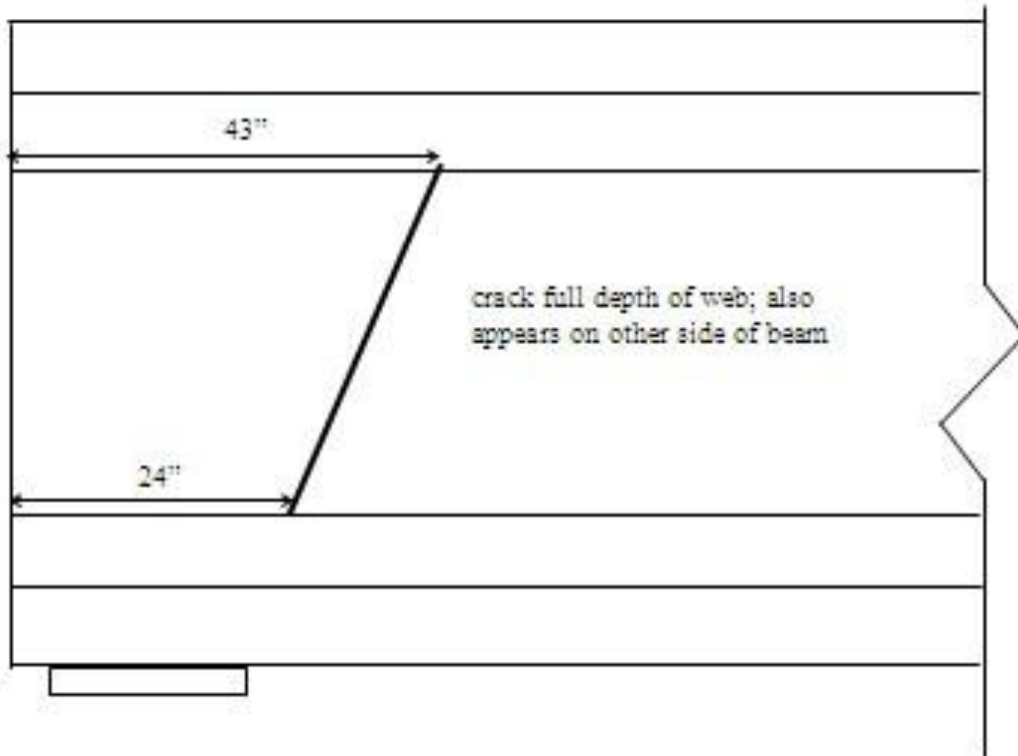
Crack diagram for south span girder, north end, 4th beam from east side, west face (#7933).
